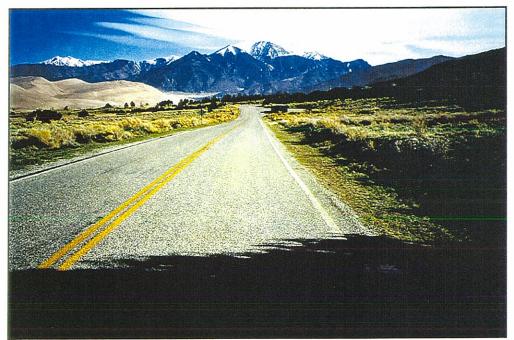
Section 6, Sample Unit 16 (MP 4.14)
